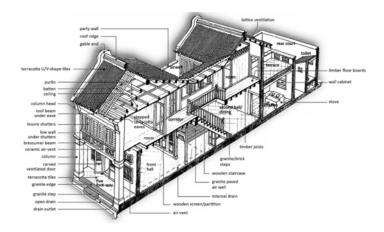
Sectional layout of a typical Peranakan shophouse [21]-[24].
